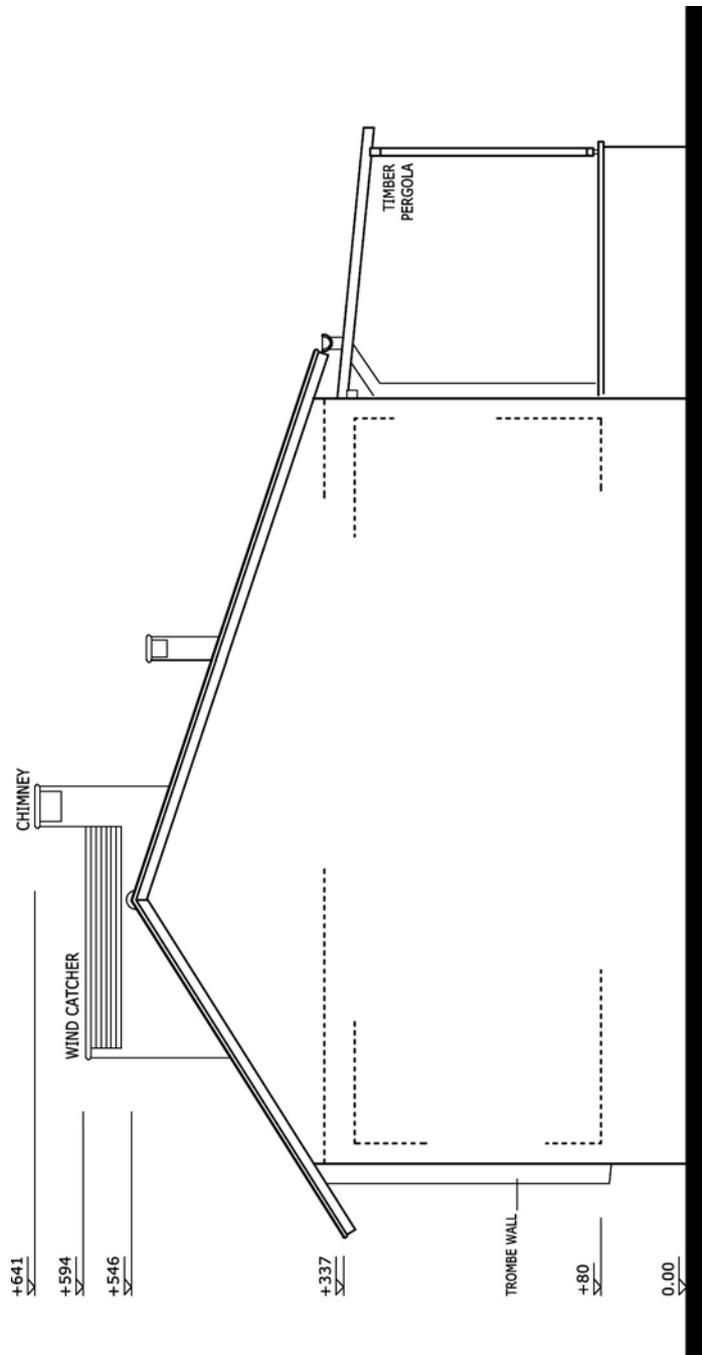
Eastern façade of type D₁' dwelling; Scale 1/80
